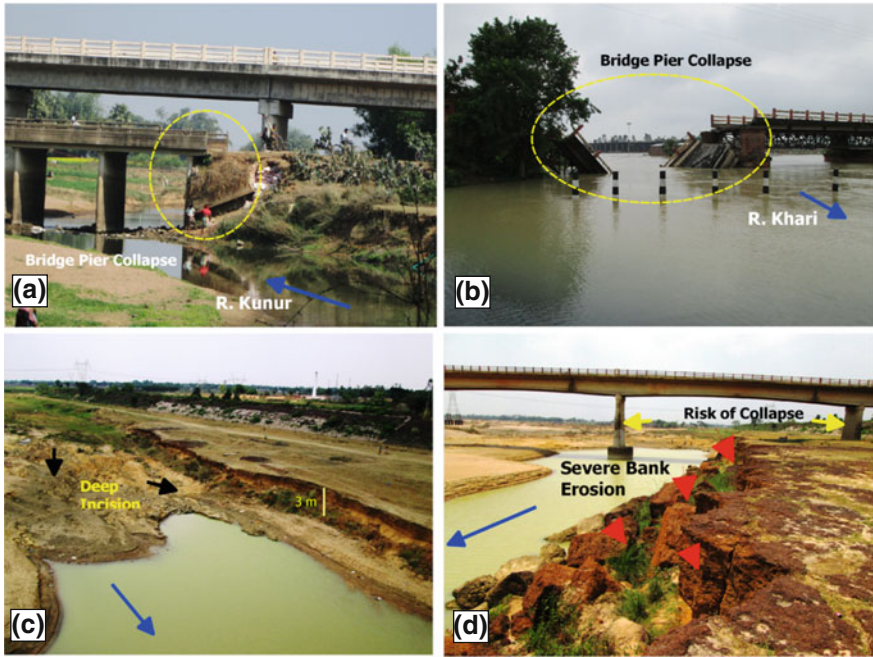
a, b Typical examples of bridge cutoffs due to pier collapse; c, d deep channel incision and severe bank erosion of Ajay River is becoming a serious problem for bridge failure at Illambazar
